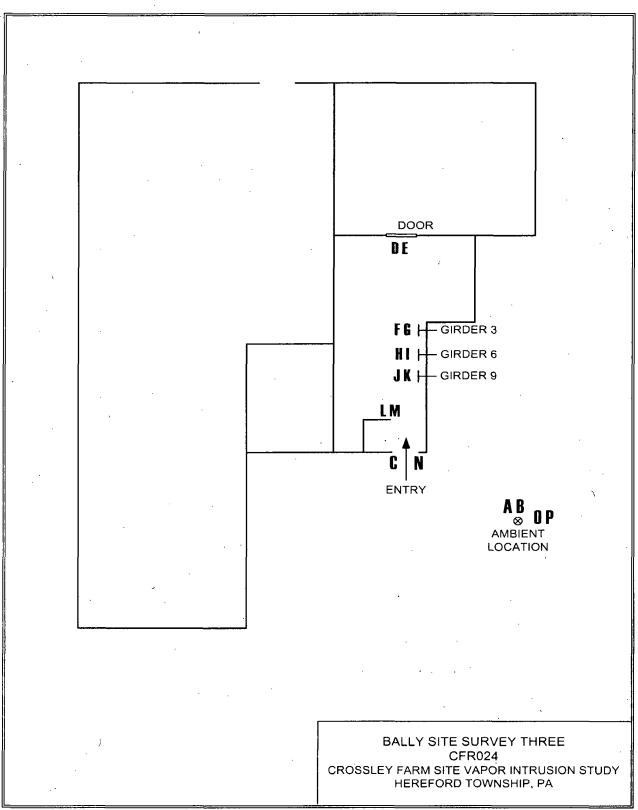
Bally Site Survey Three Floor Plan, CFR024
